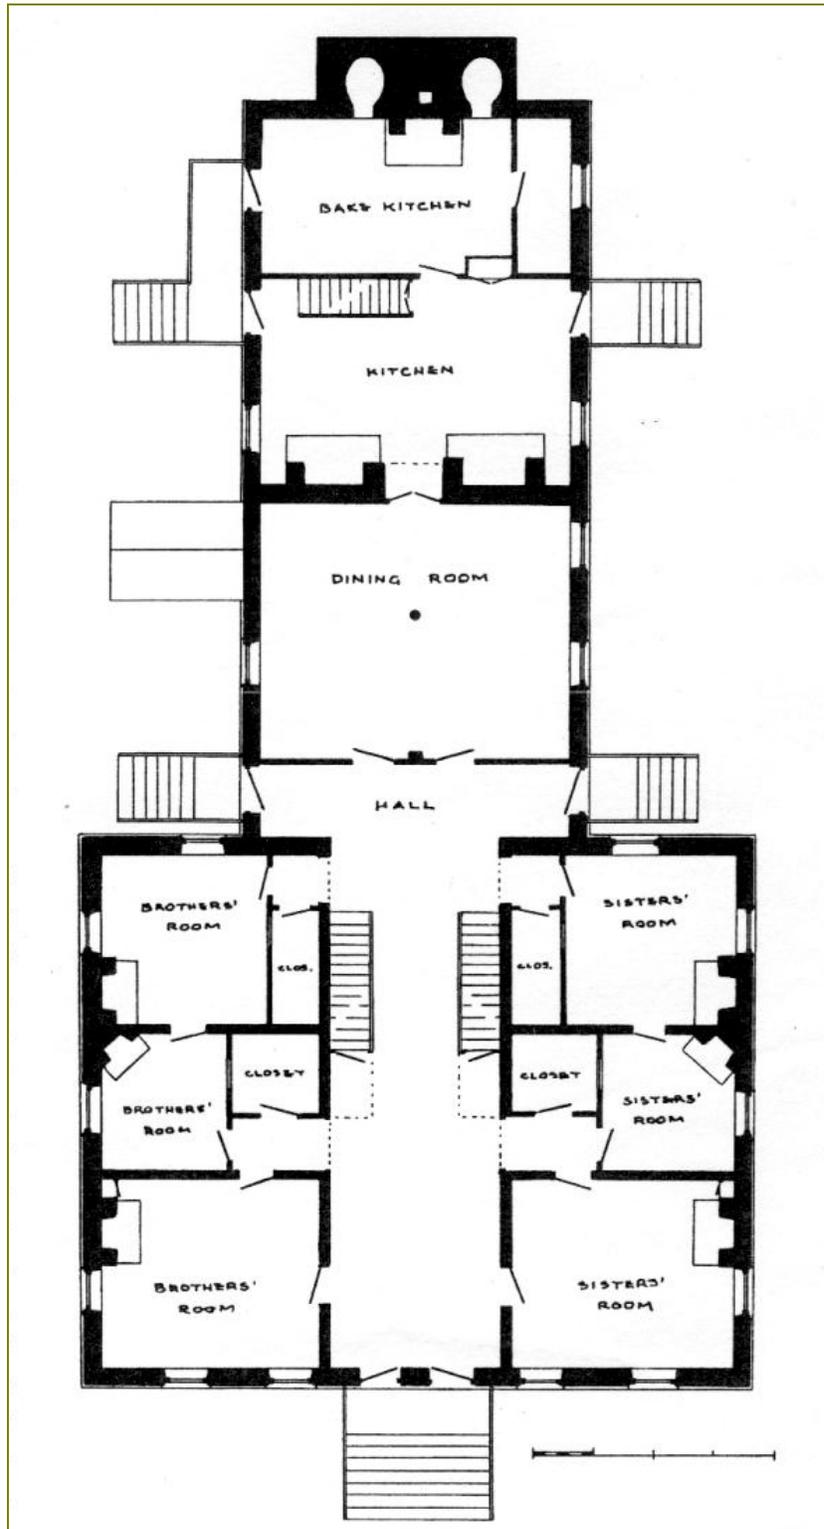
First-floor plan of West Family communal dwelling at Pleasant Hill
